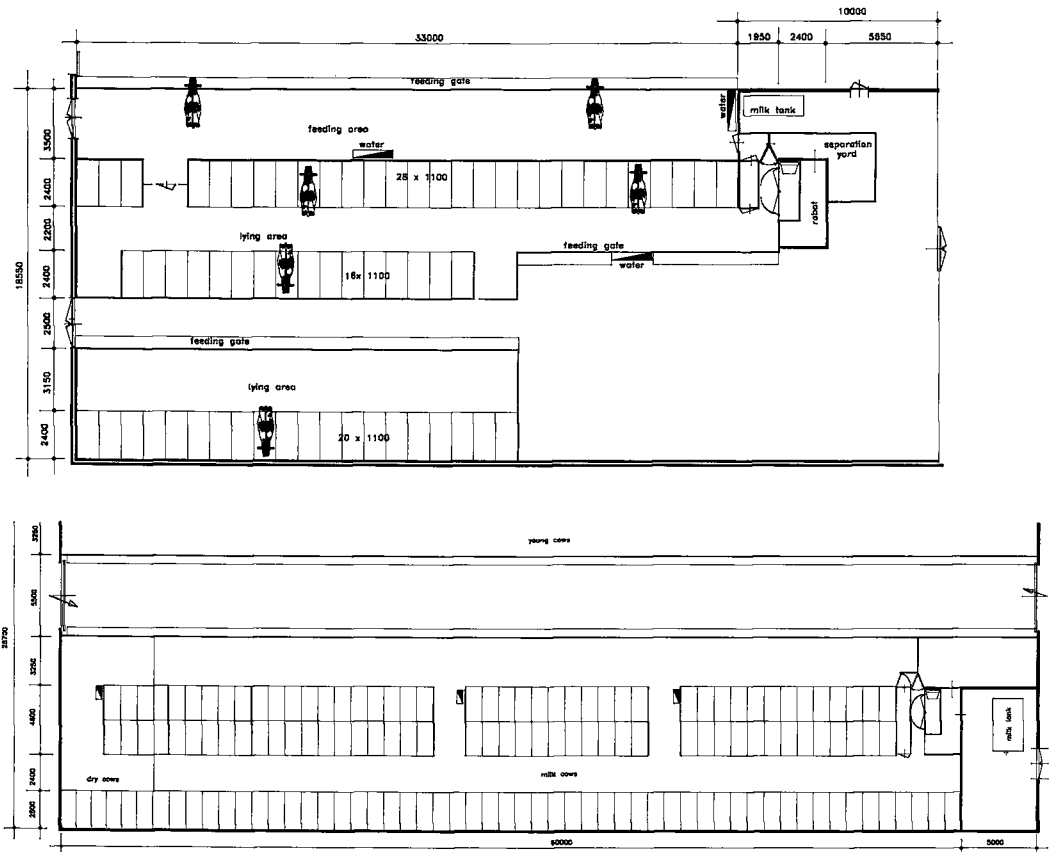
Layouts of the real (non-simulated) barns, farm A (upper drawing), and farm B (lower drawing)
